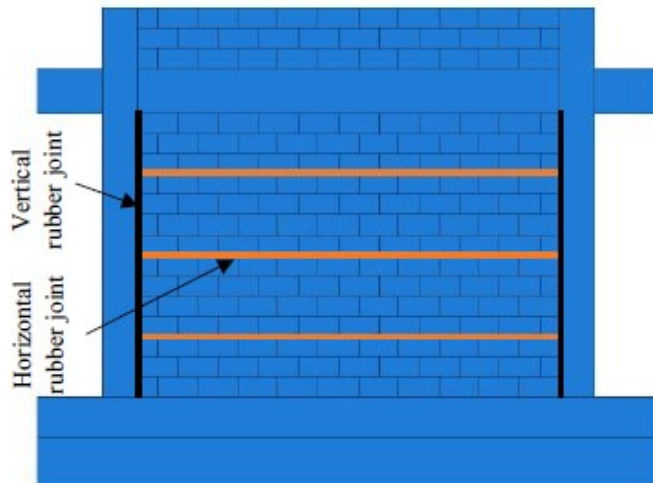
Masonry infilled frame with horizontal and vertical rubber joints (RJ\_HV).
